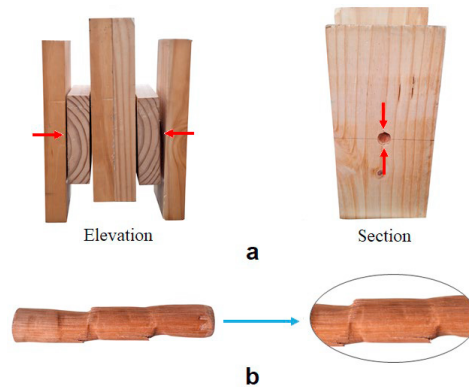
Typical failure modes in DCLT under shear tests. (a) Connection (elevation and section views); (b) Wooden dowel.
